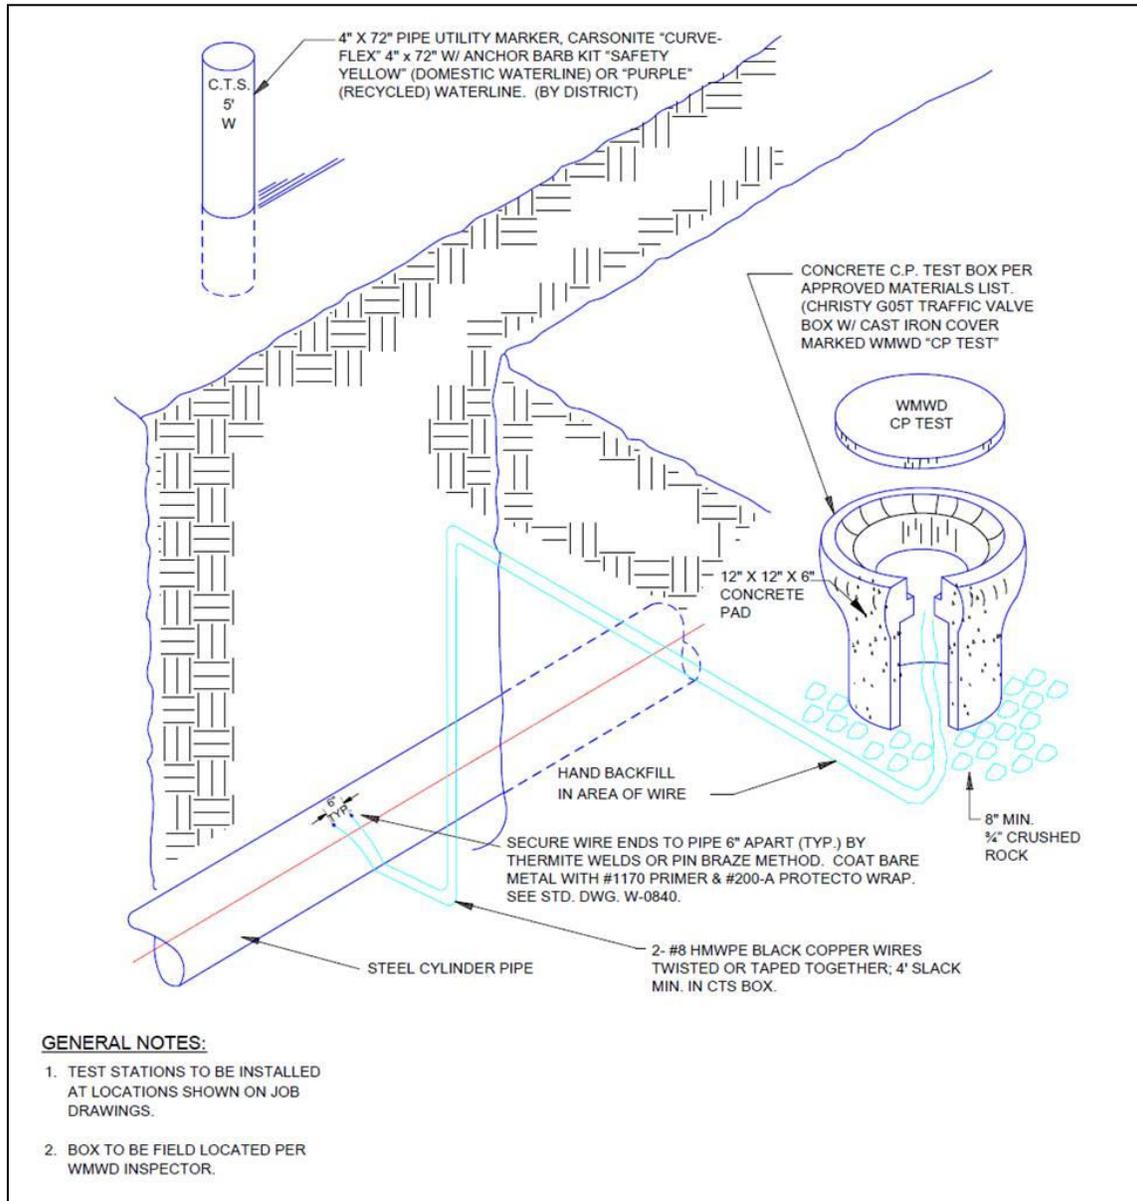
CATHODIC PROTECTION UNDERGROUND TEST STATION STEEL CYLINDER PIPE
